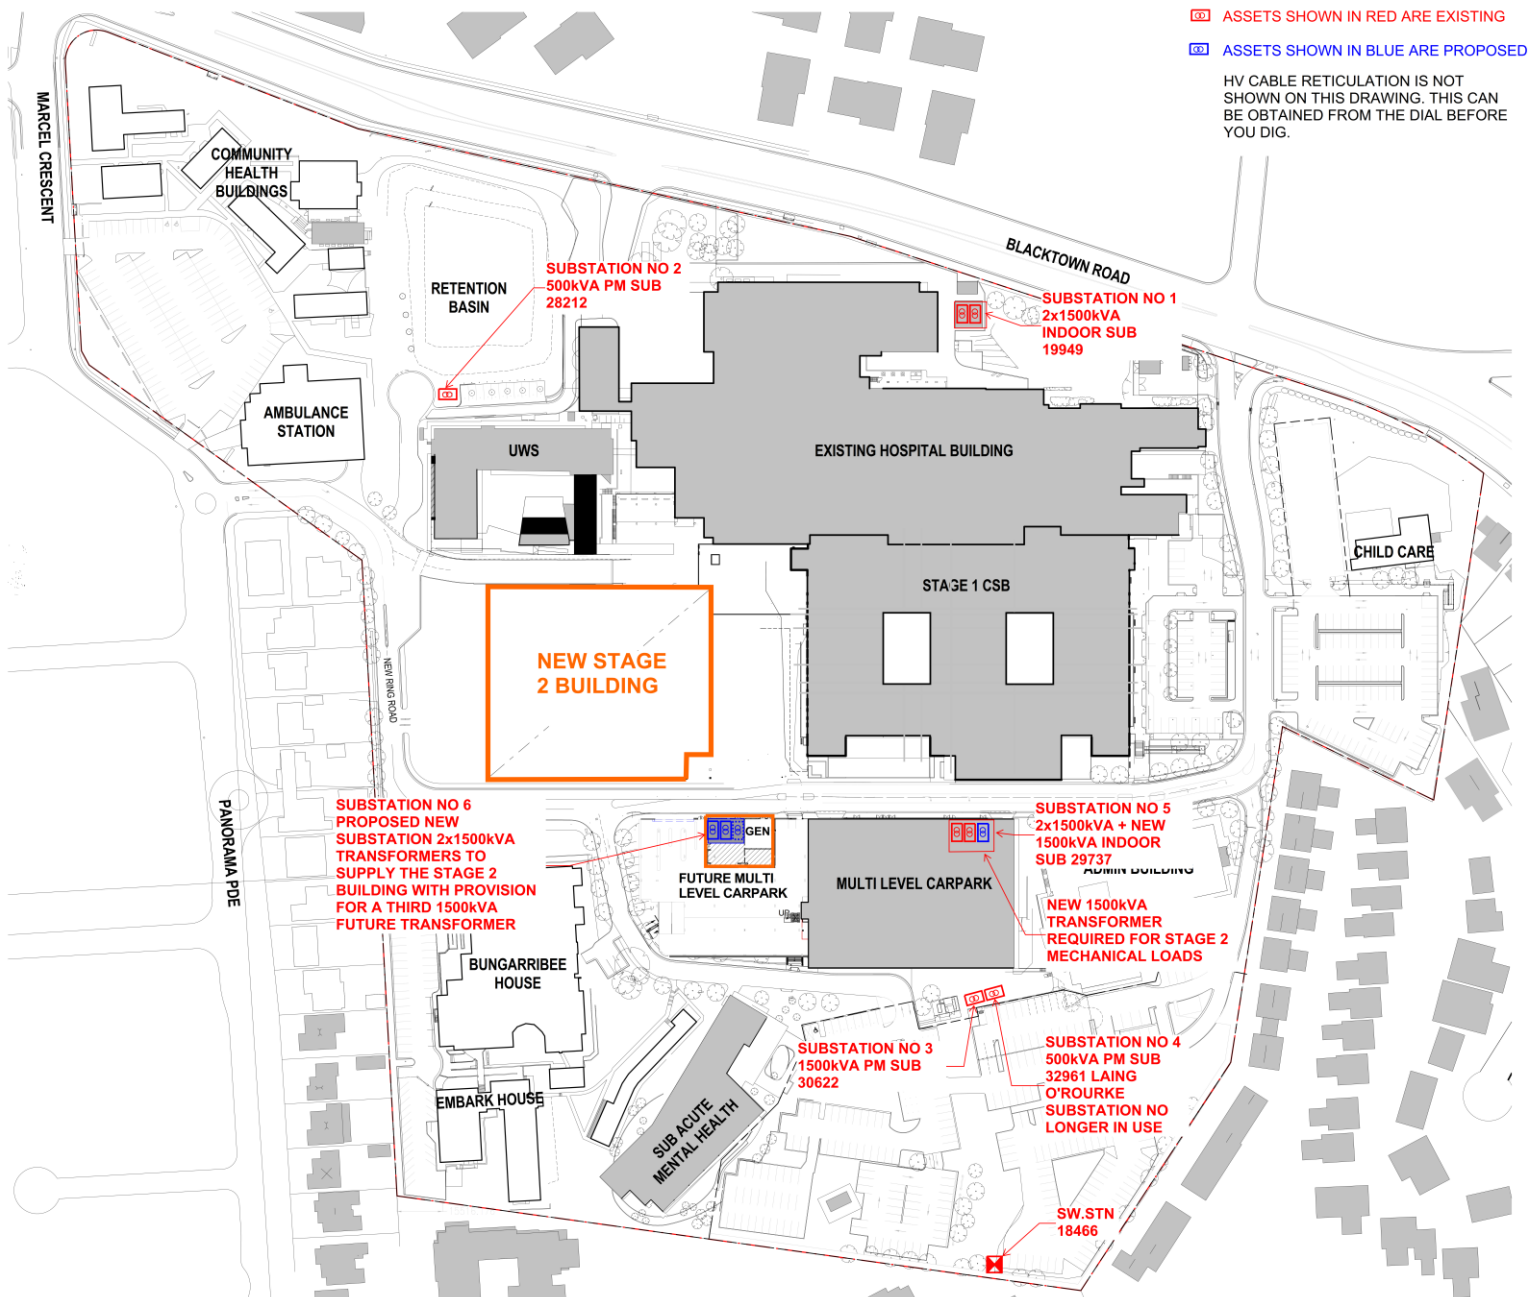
Existing Hospital Campus Building identification with the new ASB and associated new substation complex highlighted
